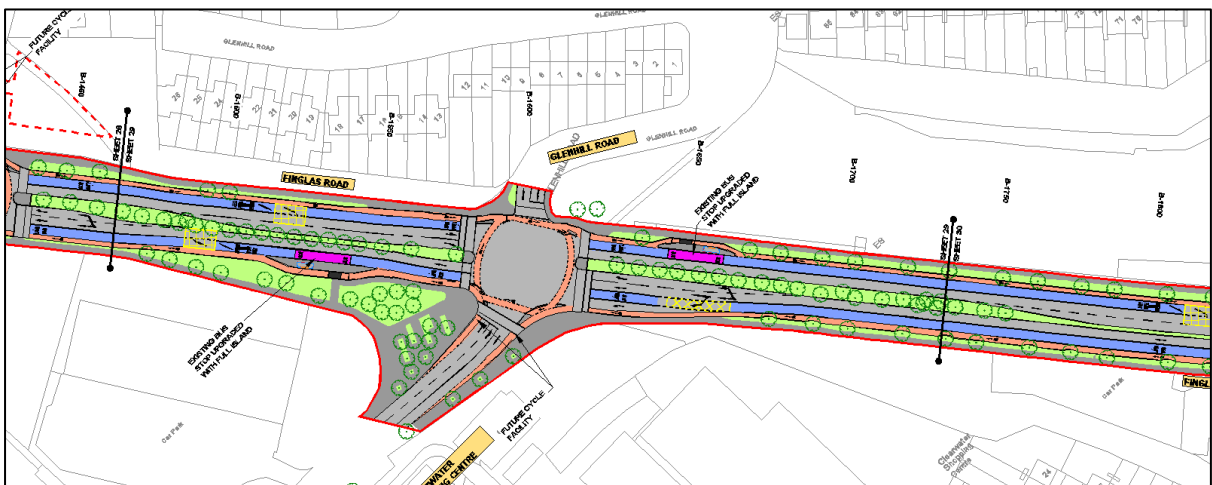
Extract from General Arrangement Drawing Sheet 27
